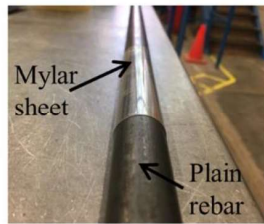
Debonding using Mylar sheet in plain rebar reinforced concrete specimen
